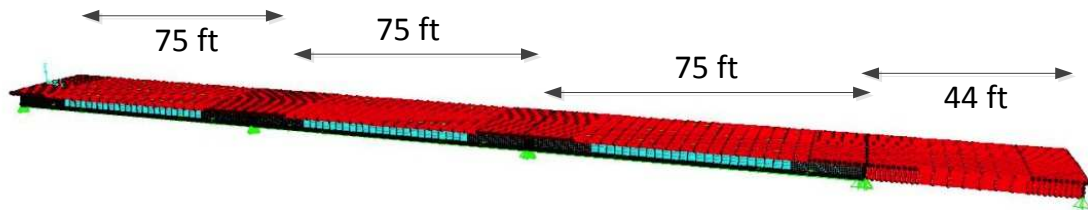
Alternative view of B-16-FM Bridge Model (unstressed, unloaded state)
